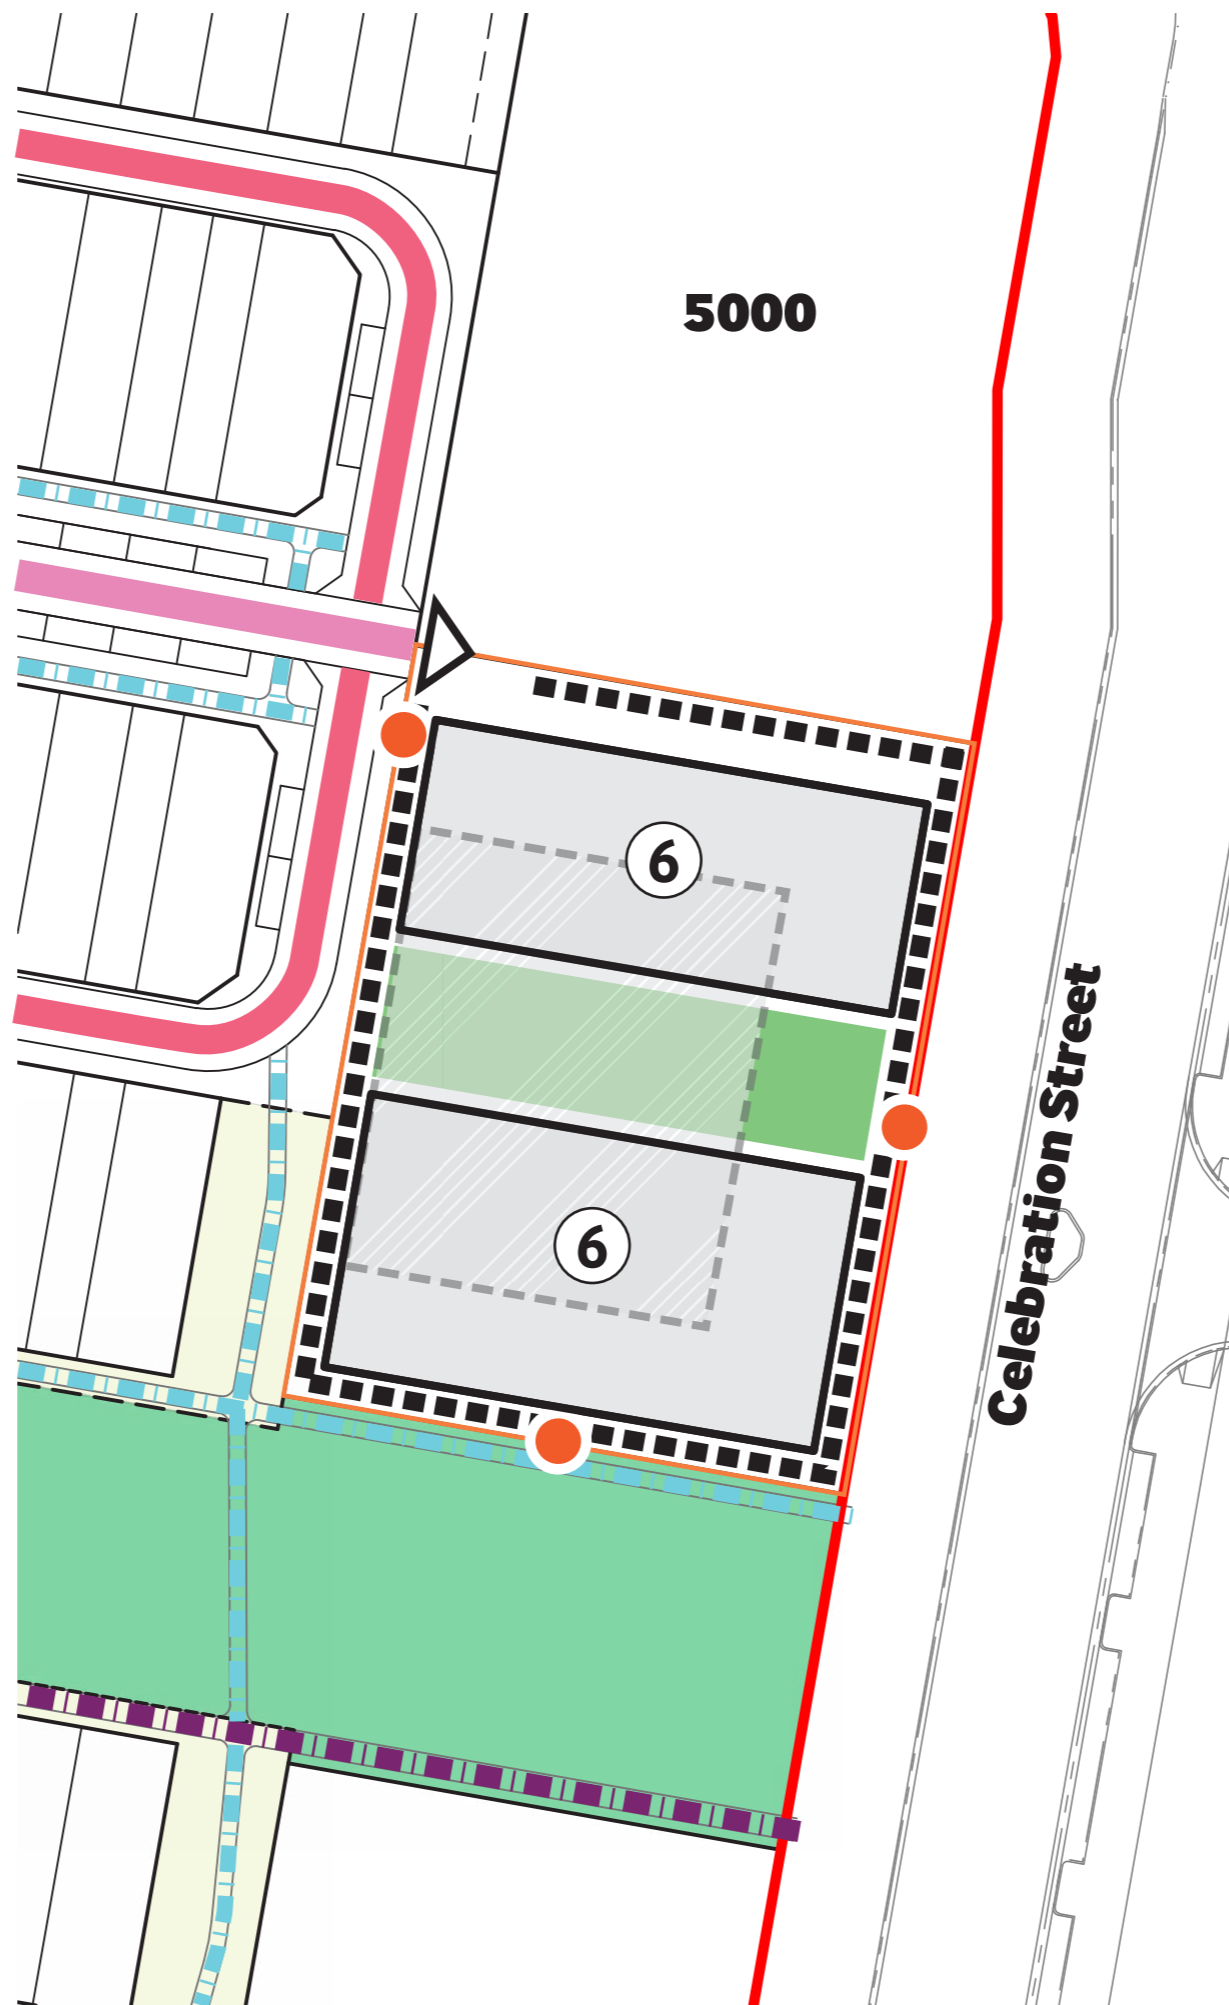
SUB-PRECINCT 9.1B - PLAN OF DEVELOPMENT
